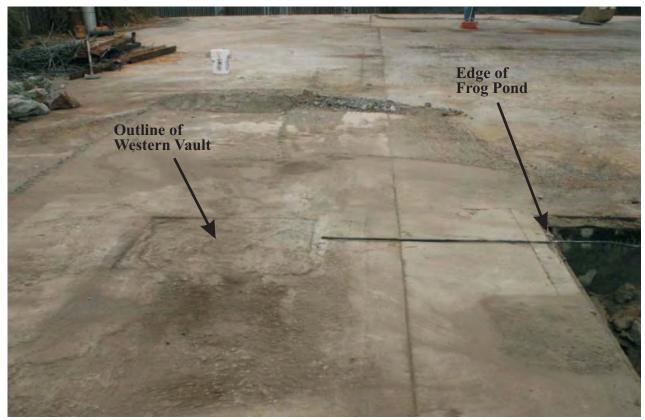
Outline of Western Vault (rebar on surface indicates alignment of metal pipe penetrating western sidewall of Frog Pond connected to sump).
